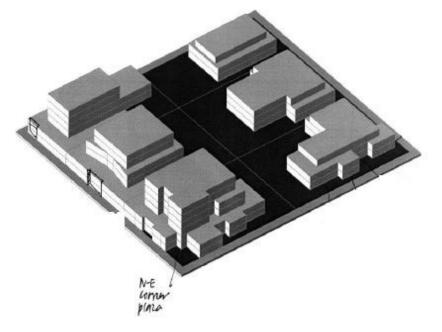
Articulation of building form with steps and recesses
